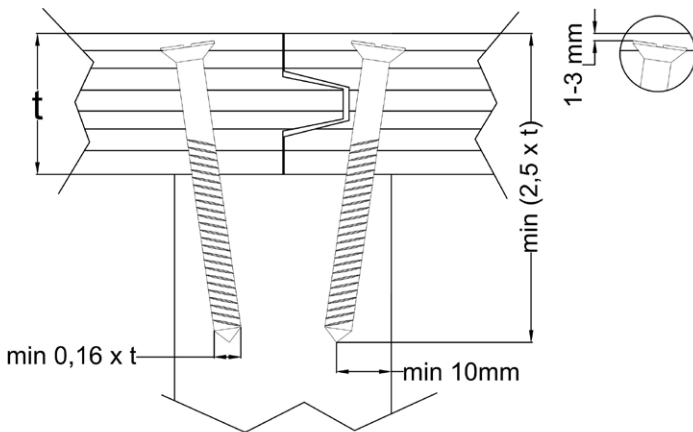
Installation of TG2, TG4 Paged plywood on floor joists.
